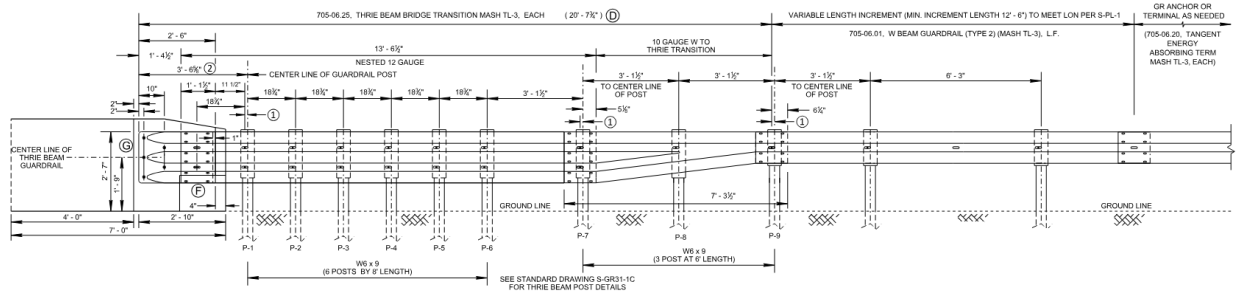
TDOT Guardrail Transition to Concrete Parapet for Highspeed Roadways – Standard S-GRC-4.
